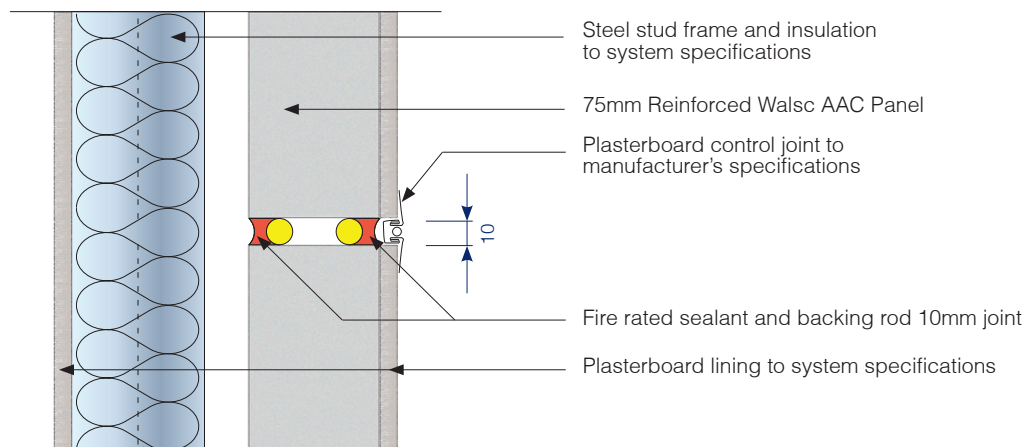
Internal Cavity Wall System Vertical Control Joint Detail
